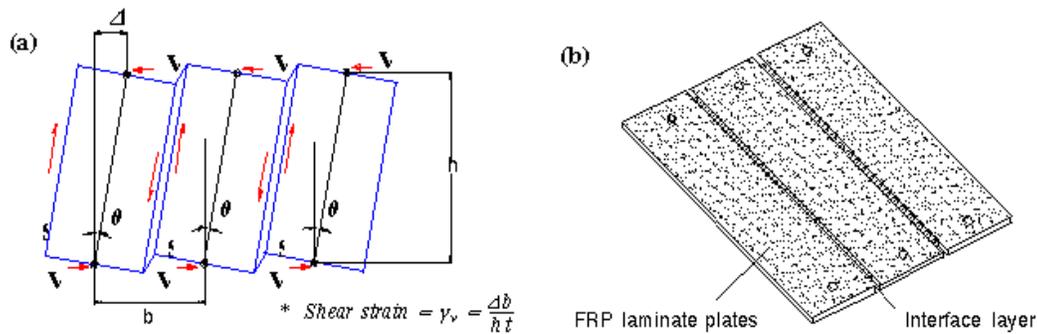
Design and Construction of the Outer Damping Panels: (a) Geometry of the Deformed Panels during Inter-story Drift (Gasparini et al., 1981; (b) Fabrication
